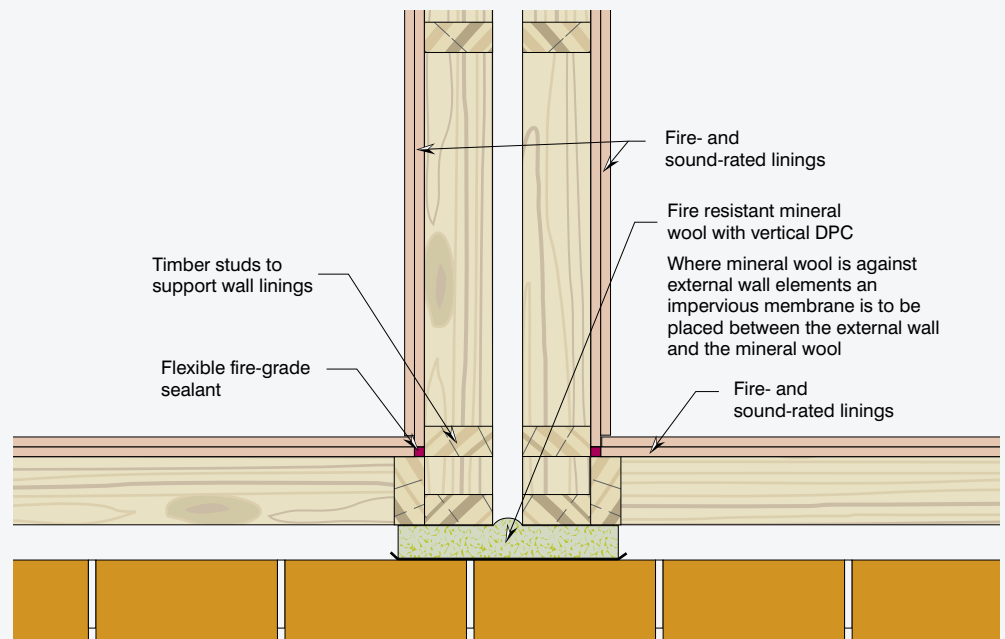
Typical junction of elements with the same FRL – fire-rated bounding wall abutting fire-rated external wall – plan view.
